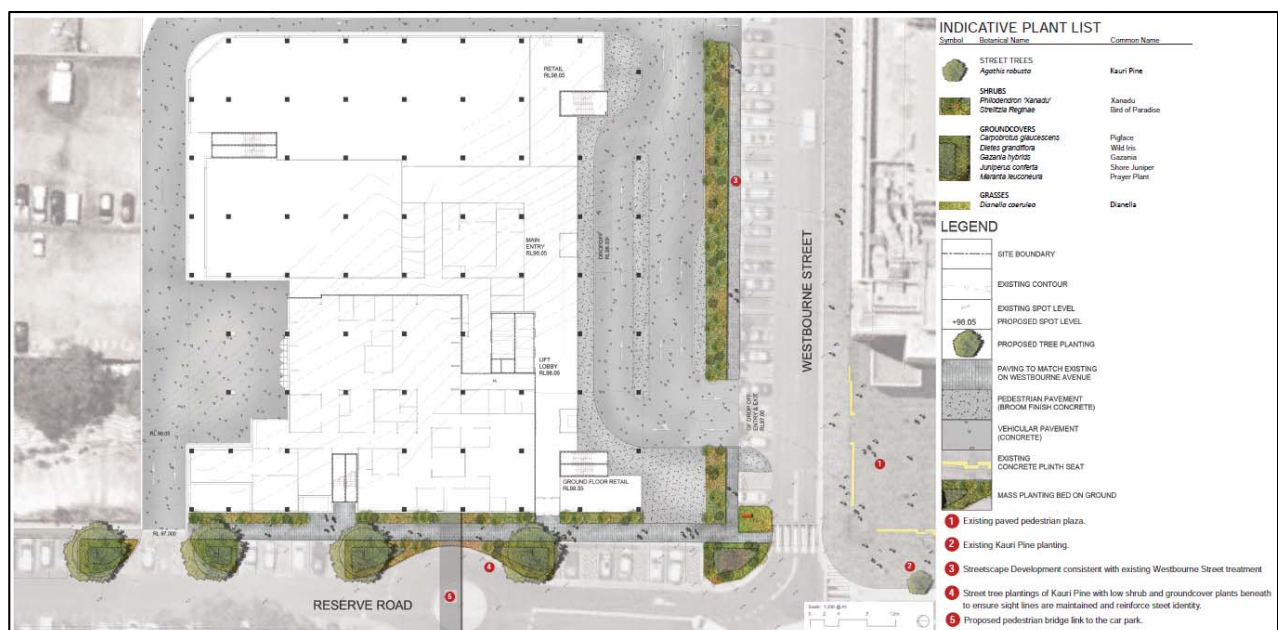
Proposed Landscaping Plan (Base source: Tower A RtS)
